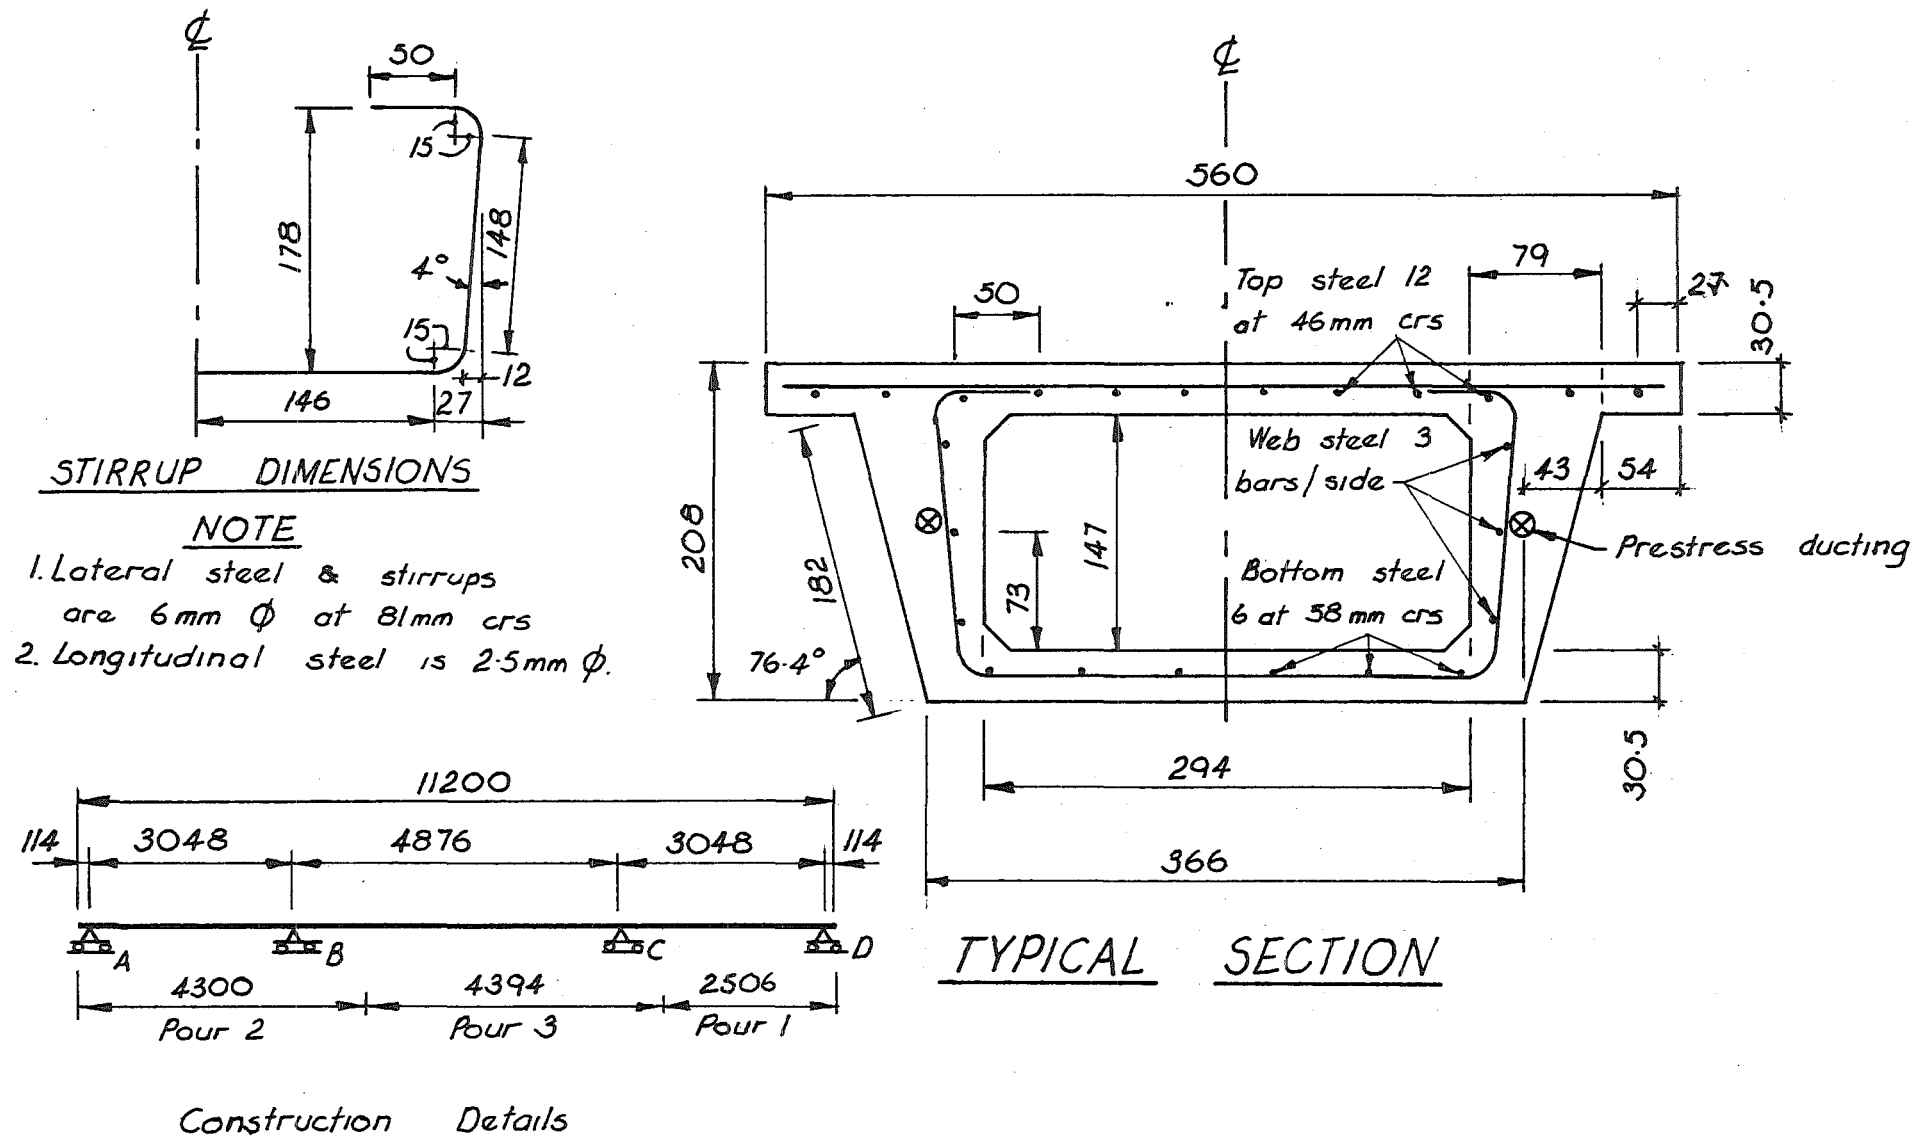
STRUCTURAL DIMENSIONS AND MILD STEEL REINFORCING DETAILS OF BEAM THREE
